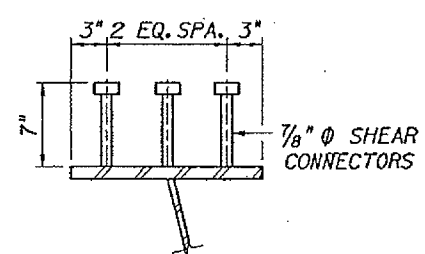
DETAIL OF FLANGE TO WEB WELD
